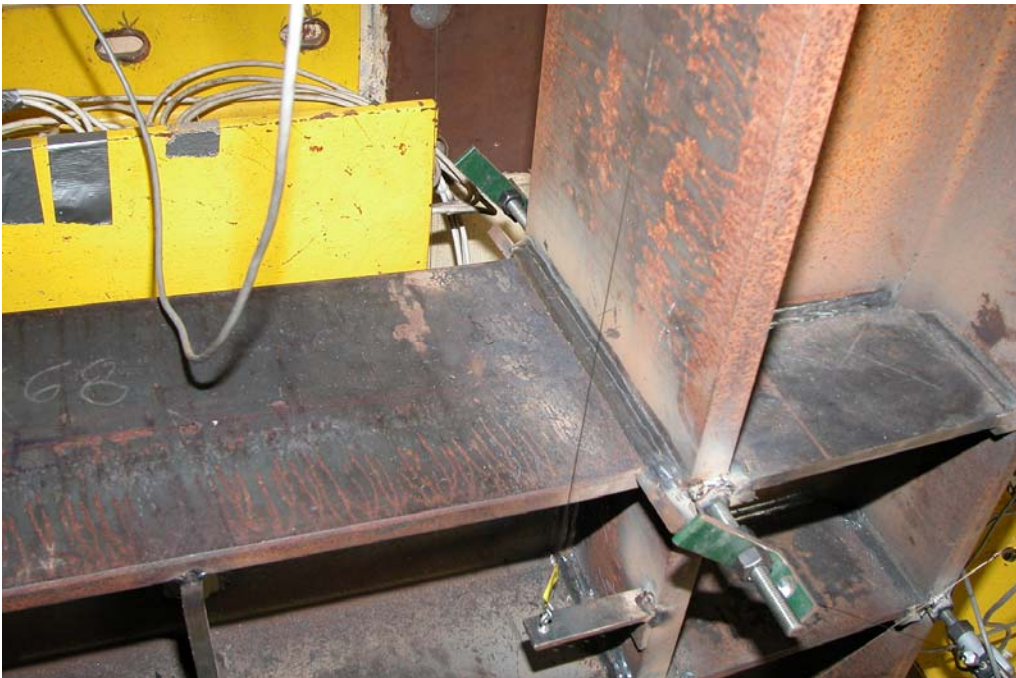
Partial penetration groove weld of the link top flange – Specimen AISC-4
